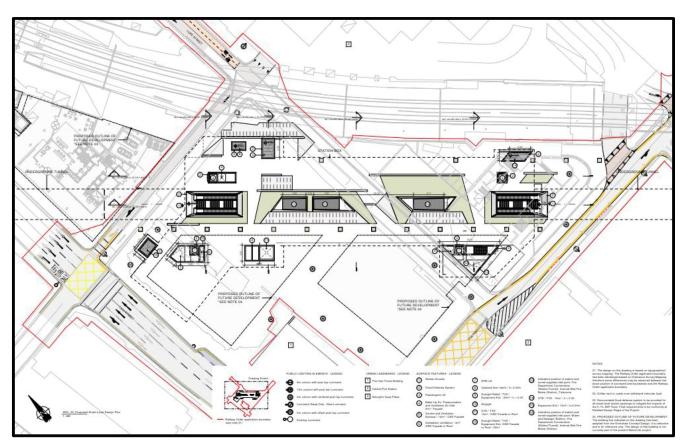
Proposed Street Level Design Plan of Tara Station
